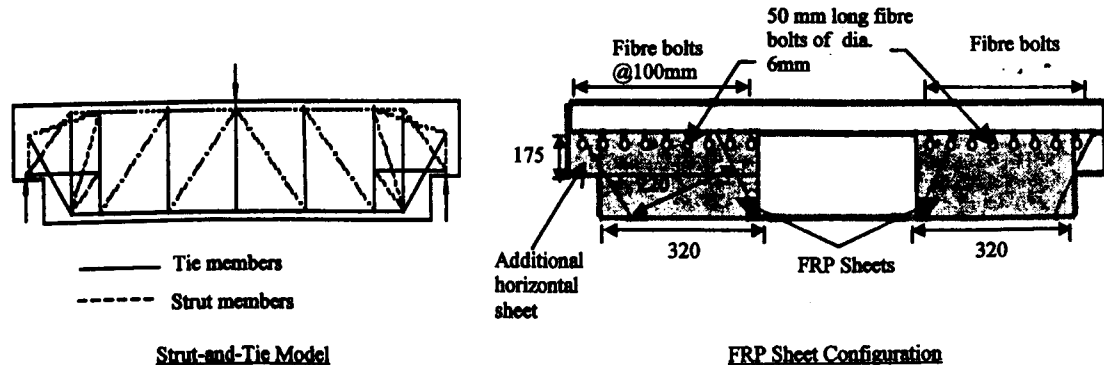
Strengthening of dapped beam using strut-and-tie Method
